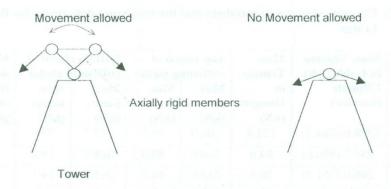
(a) The cable arrangement used over the tower to allow movement. (b) The use of a pin will not allow movement
